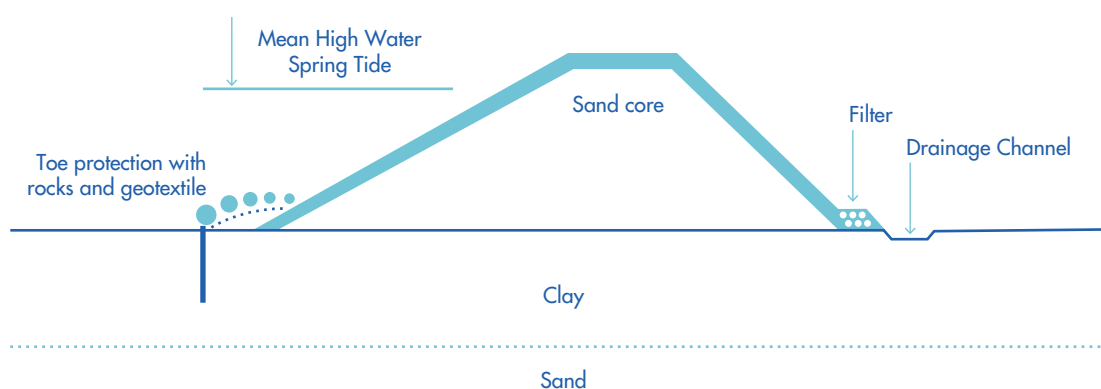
Typical sea dike cross section (Source: The authors).
